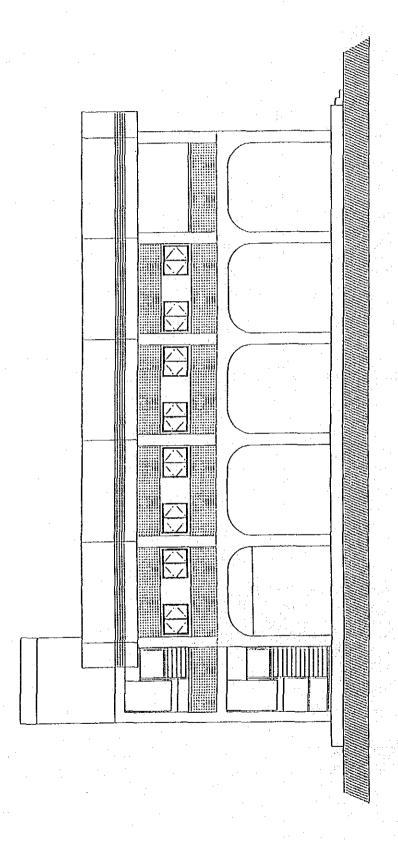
(4) ELEVATION (3-CLASSROOM TYPE)
